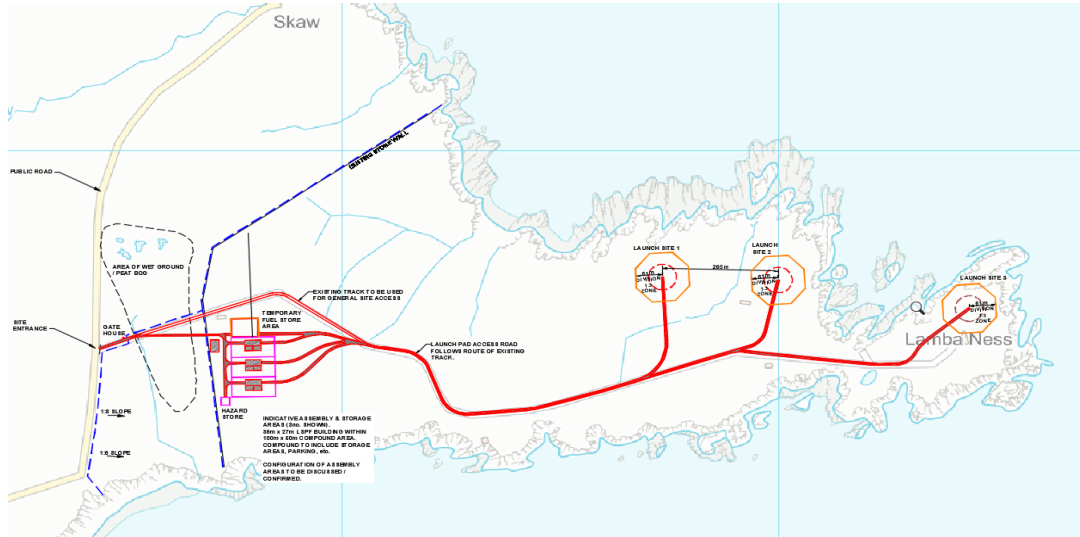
Proposed Launch Site Preliminary Site Layout
